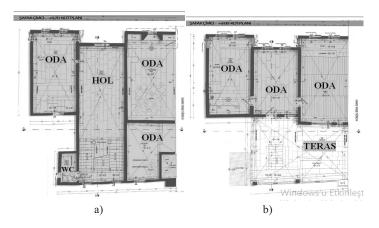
a) Şafak Çivici +0.70 Elevation Floor Plan (Mid-Floor), b) Şafak Çivici +3.00 Elevation Floor Plan (Upper Floor)
